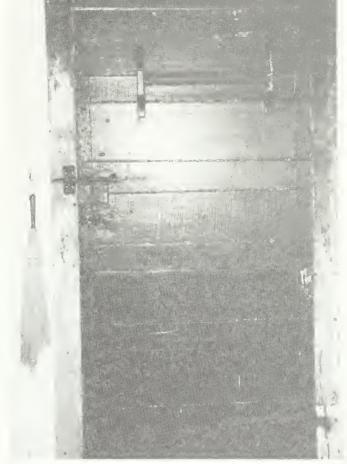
Kitchen (Room 105), north wall, doorway D105.
